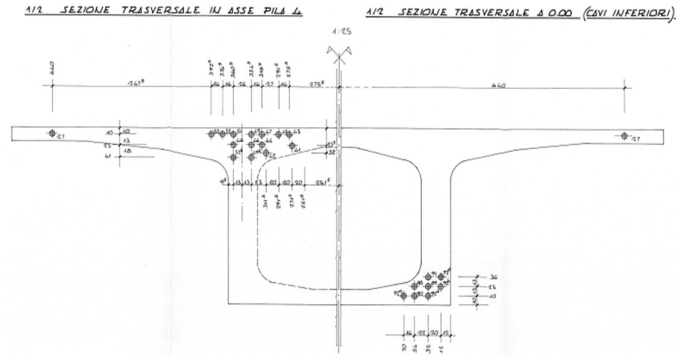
Cross-sectional view and arrangement of tendons between pier 4 and pier 5.
